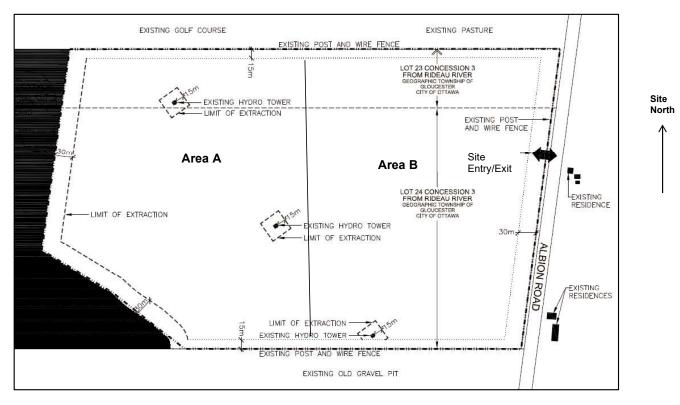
Site Plan, Proposed Cavanagh Ottawa Airport Pit
